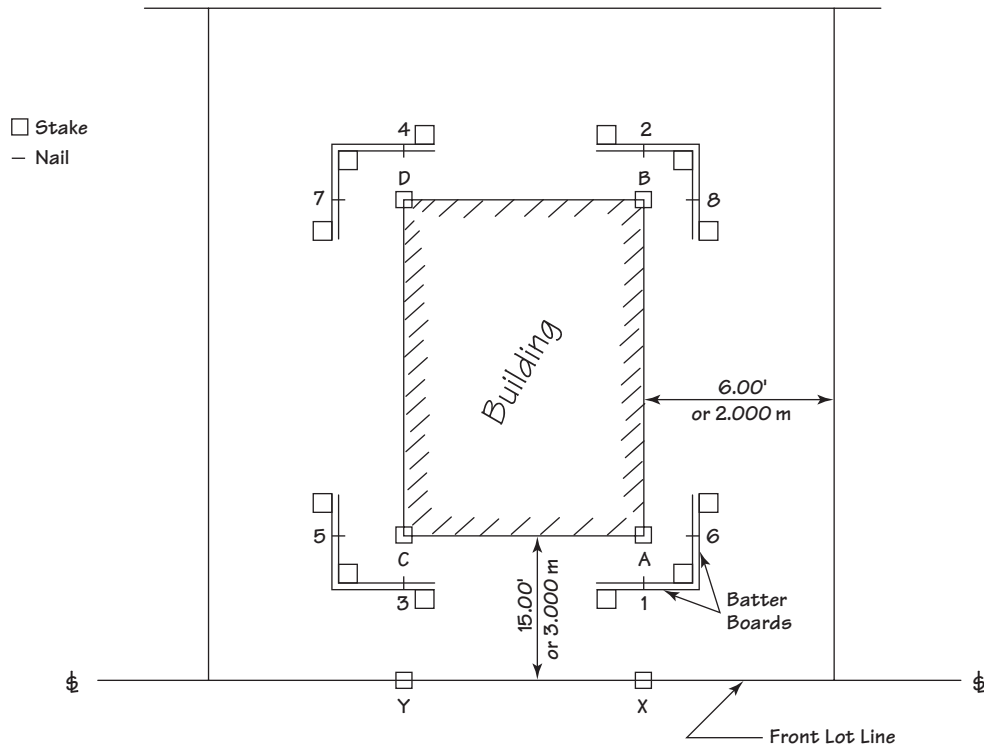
Sample field notes for Project 7 (building layout) (re-position the nail symbols to line up with the building walls).
